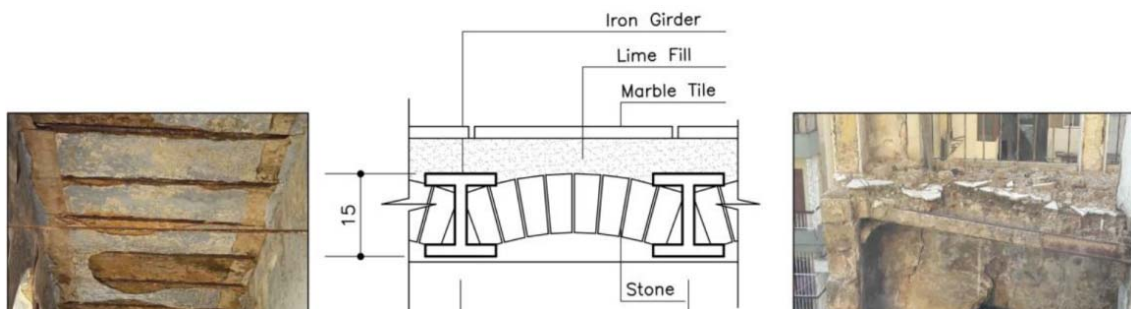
Notifying the development of armed technique using iron rods and stones, where spaces are possible to achieve spans wider. The photo shows in details the existence of Jack arch slab in Bechara el-Khoury mansion (idem).
